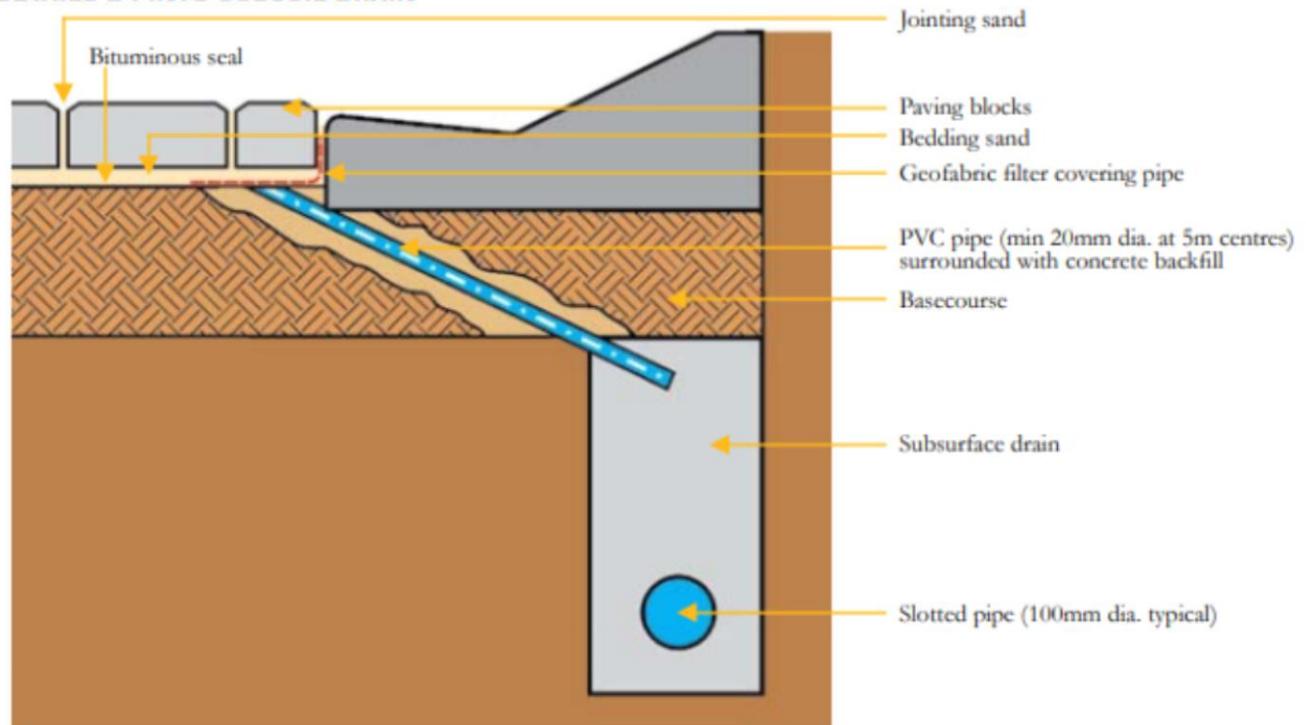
INTO DRAINAGE PITS USING SUB SOIL DRAINS
